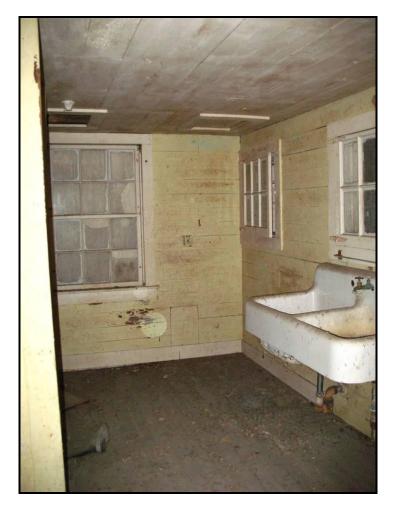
Detail of Kitchen Wing, View Looking Northwest.
